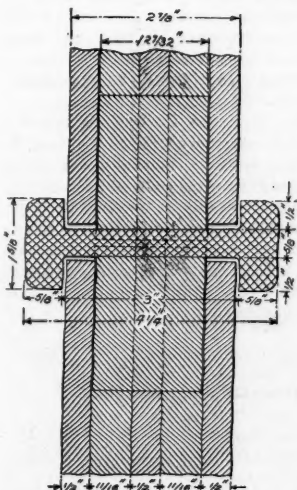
Half Pins and Key—Bellefontaine Bridge Viaduct.
